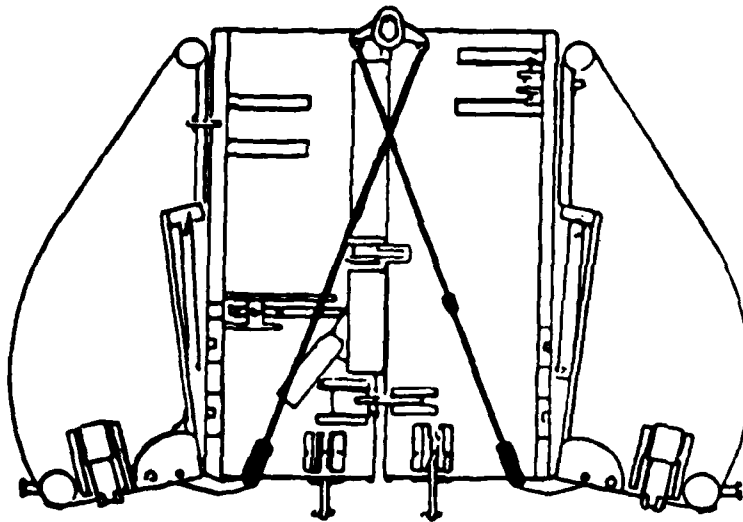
End view of folded ramp bay section of the ribbon bridge.
